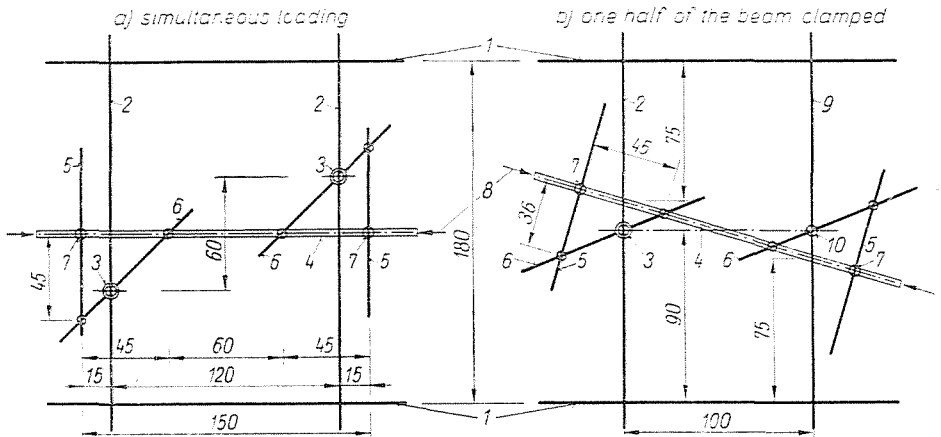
Loading arrangements in top view. 1. Longitudinal girder of basic setup; 2. Loading frame; 3. Hydraulic jack; 4. Test beam; 5. Clamping rig; 6. Spreader beam; 7. Ball bearing; 8. Steel girder supporting the ball bearings; 9. Clamping bracket; 10. Ball joint (torsional reaction)
